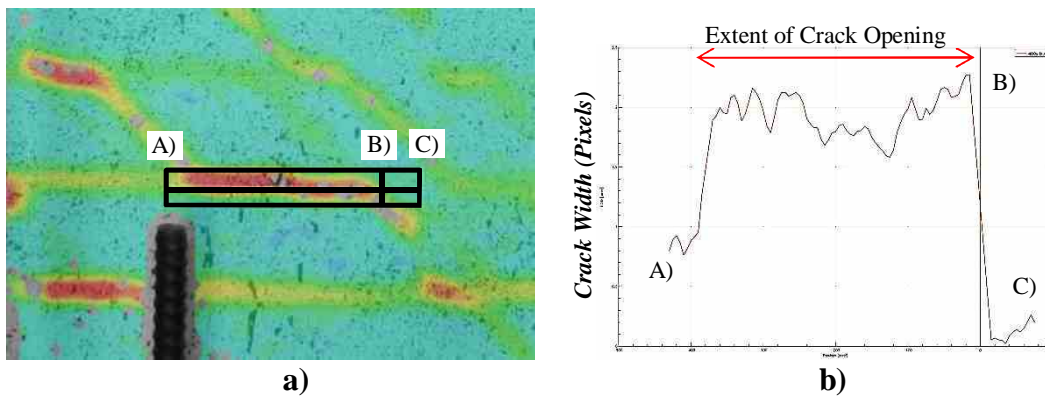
Determining Crack Widths in Walls: a) Close Up of a Crack Formation with Crack Measuring Tool, and b) Plot of Measured Relative Deformation over Crack Length Indicating Crack Width
